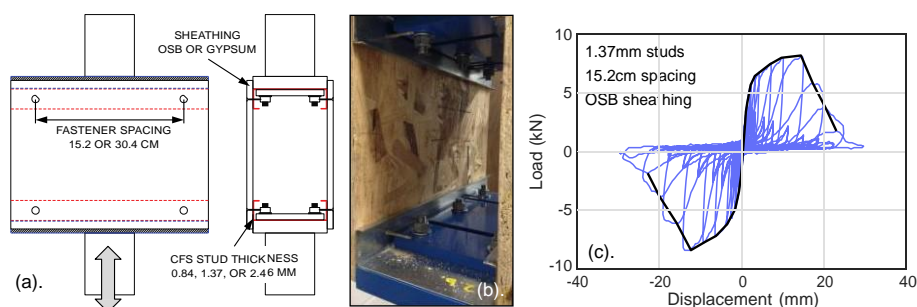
Fastener testing assembly (a) front, and side detail, (b) photograph of test specimen and (c) typical hysteretic response with backbone
